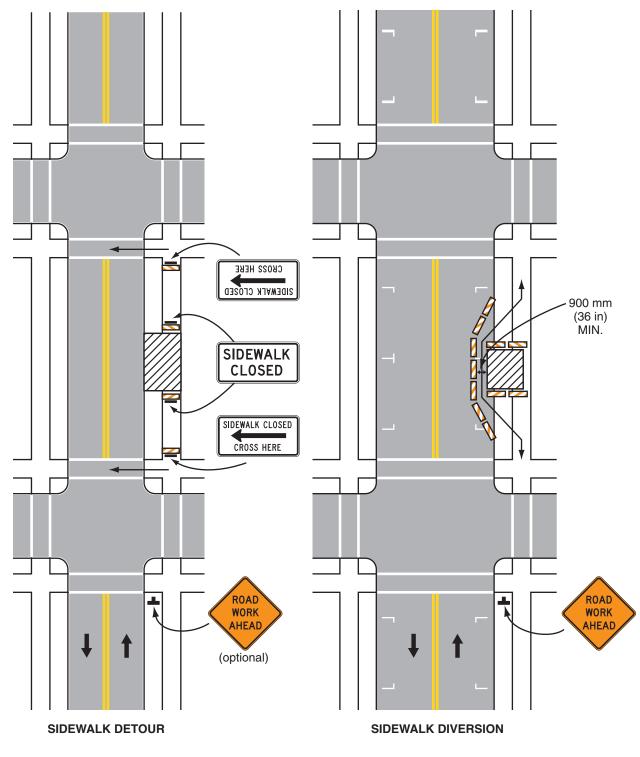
I-28. Sidewalk Detour or Diversion (TA-28)
